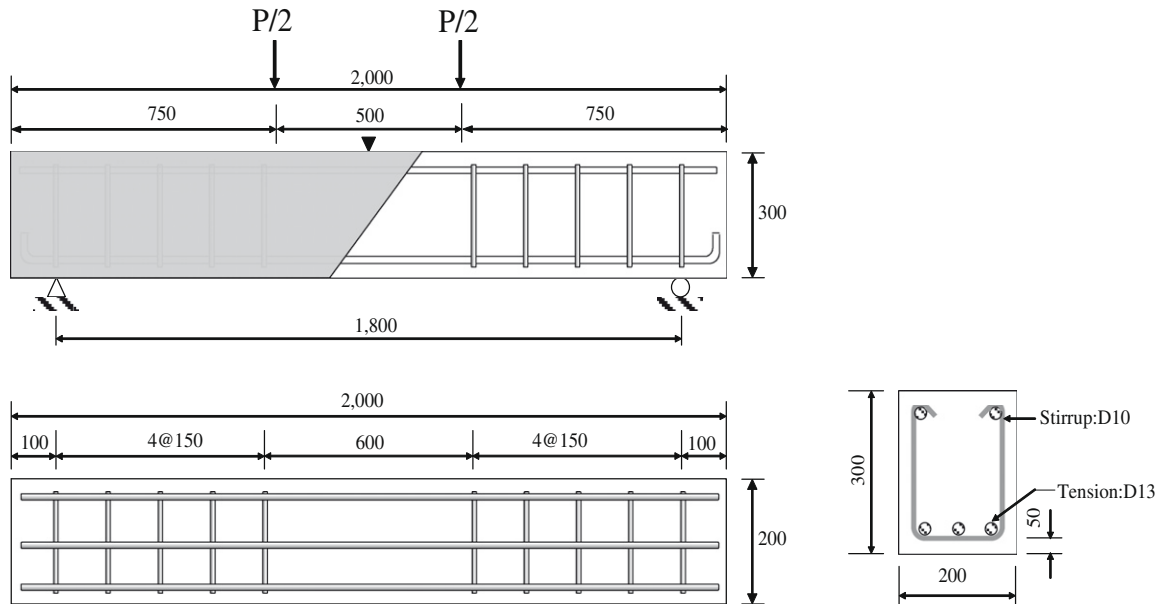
Dimensions and details of RC beam specimen (unit: mm).
